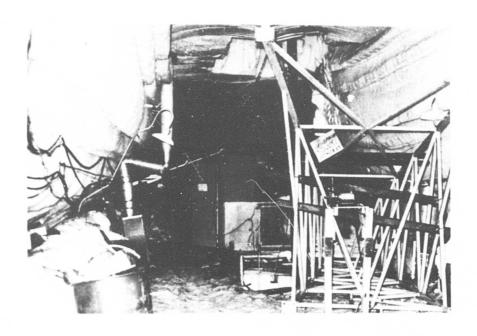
Drill rig and tower. Note kink in stack as a result of ceiling and snow subsidence.
